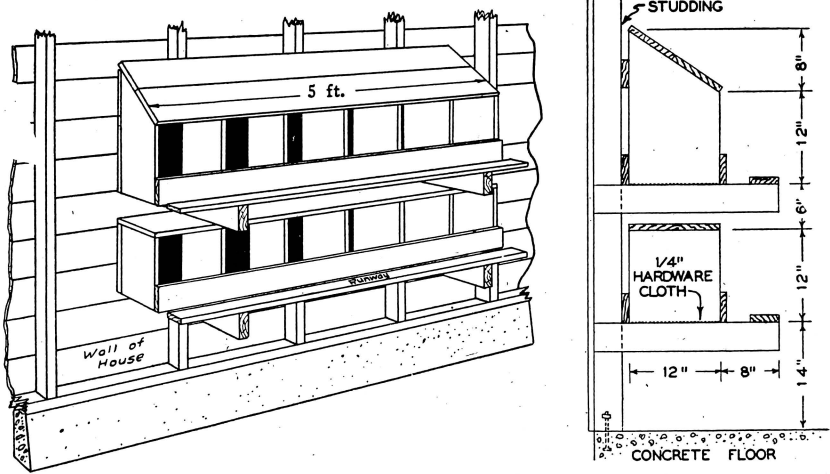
Double tier of wall nests. At right is end view showing details of construction.
